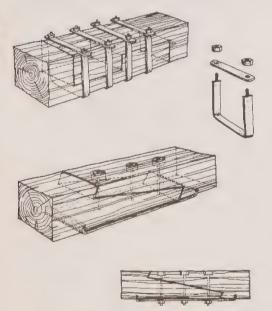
The joints supplemented with bolts, metal plates and "U" bolts.
